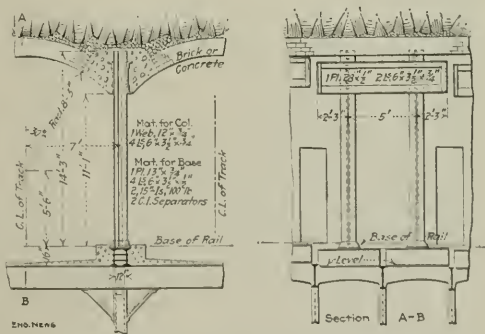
ALTERNATIVE DESIGN FOR CENTER WALL USING STRUCTURAL STEEL INSTEAD OF REINFORCED CONCRETE
